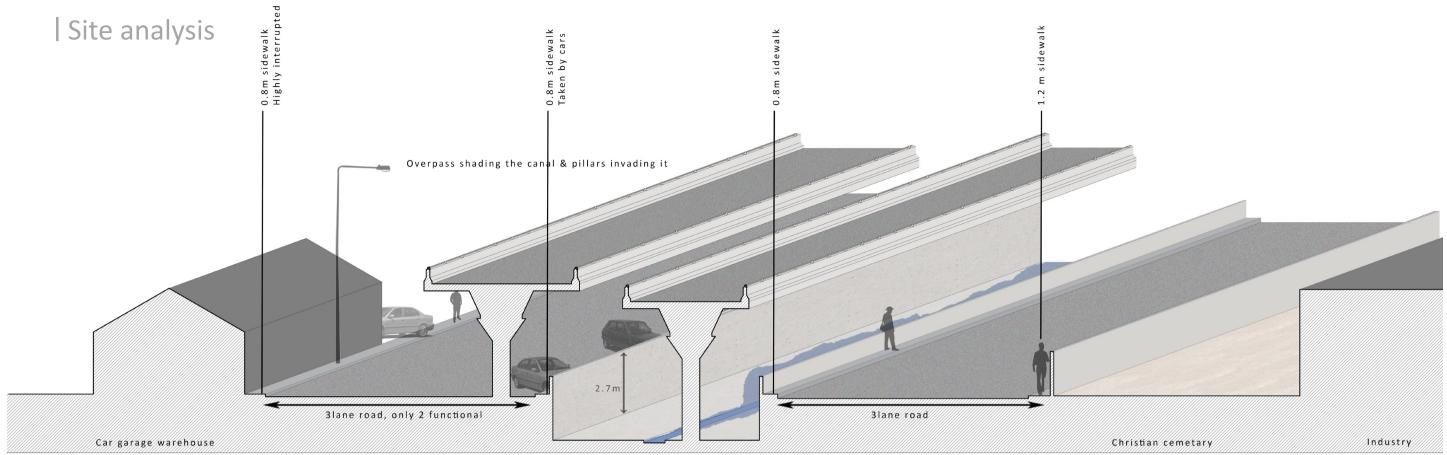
Section C-C Scale 1:200 Inner canal disappears, water flows wider and slower
